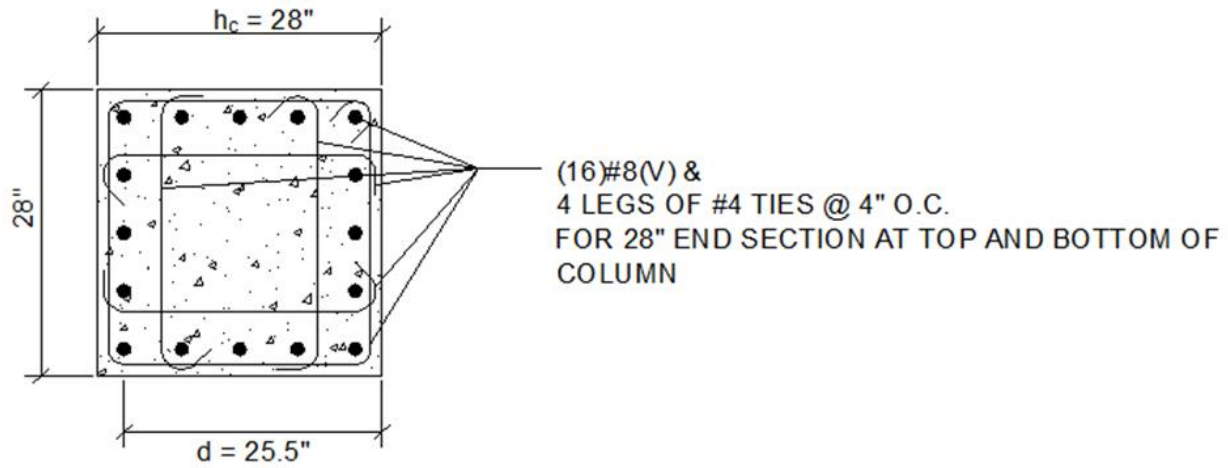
Exterior column, cross section at end of column at the 2nd floor level based on tsunami design requirements.
